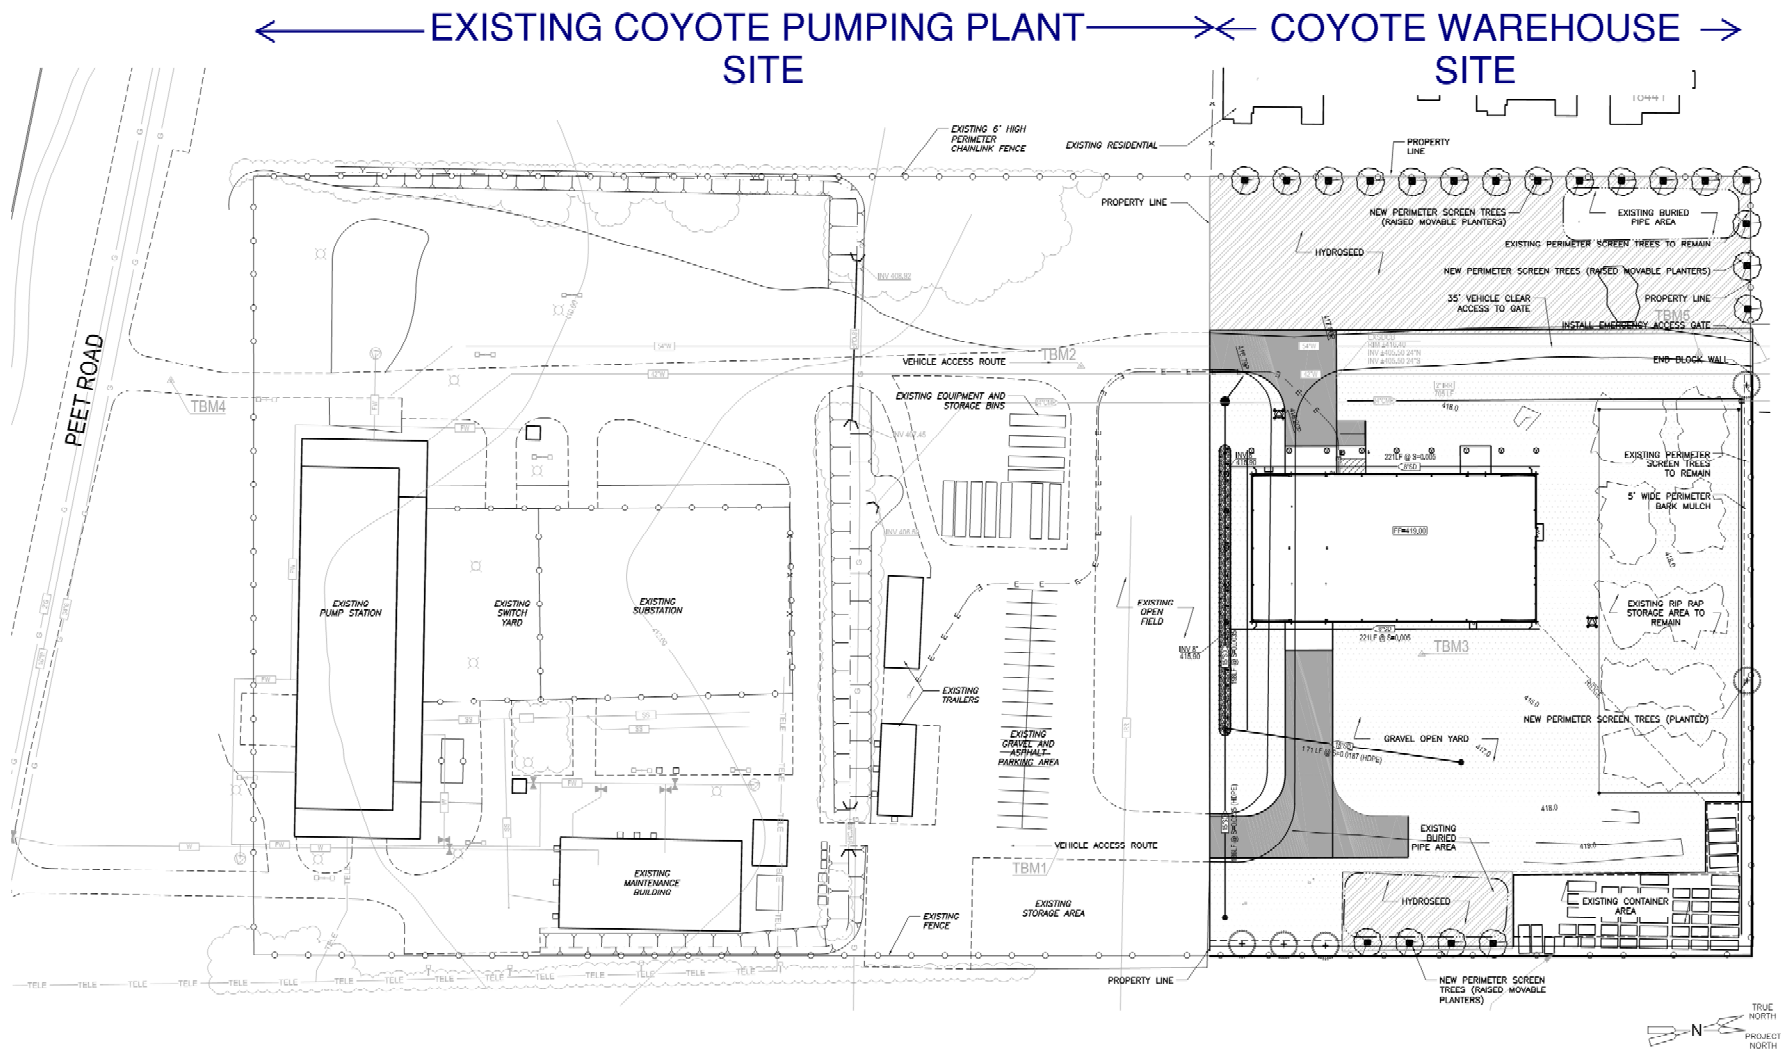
Coyote Warehouse Site Adjacent to Coyote Pumping Plant
